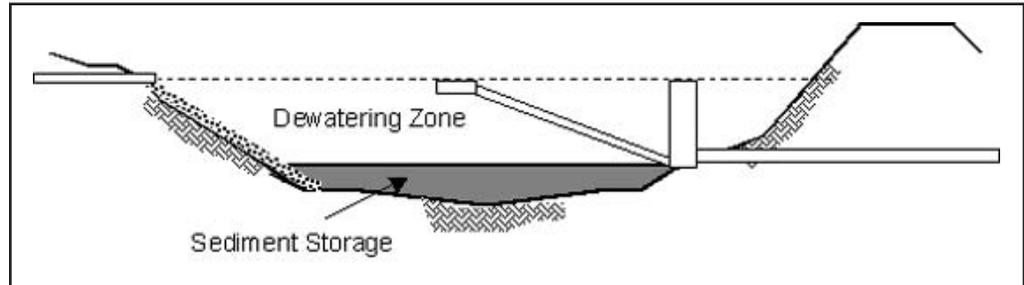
Pool showing dewatering area and additional sediment storage area
